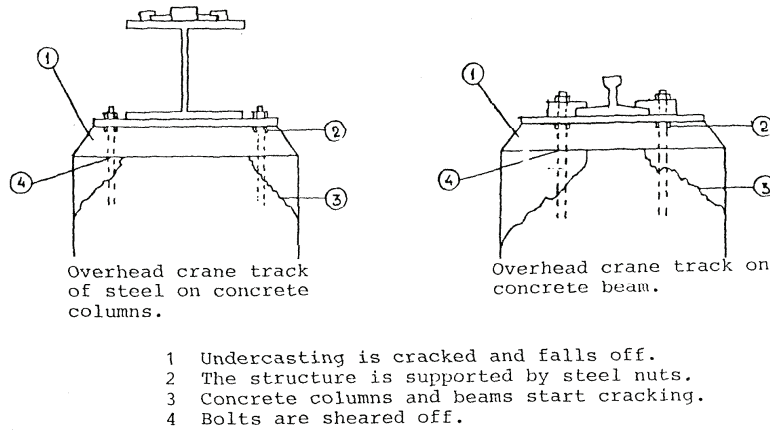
Failure sequence of the supports under the travelling crane, CEB (1988).
